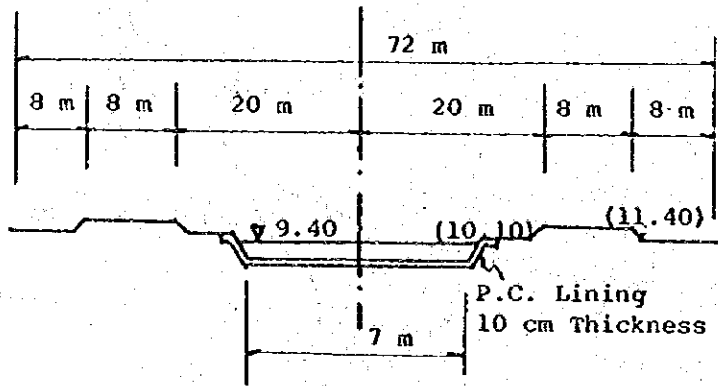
SCHMATIC PLAN OF SULHEIYA CANAL
